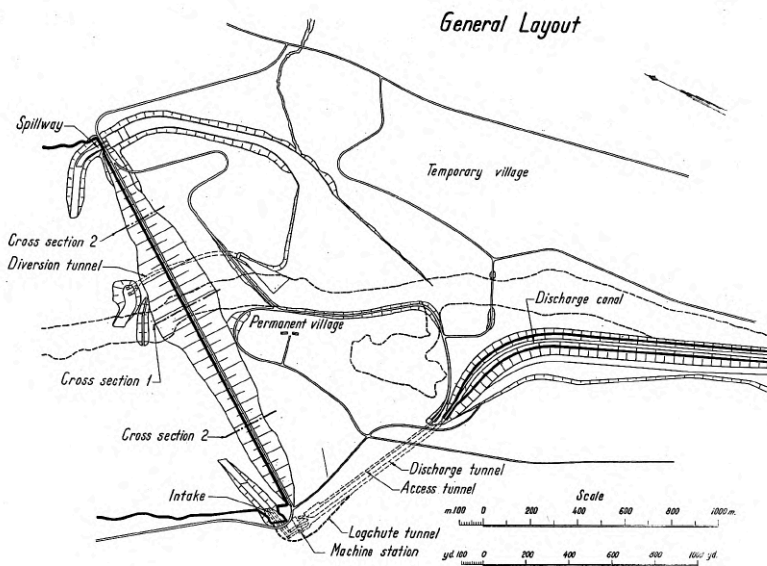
General layout for the building site of Messaure. Vattenfall, ca. 1955
